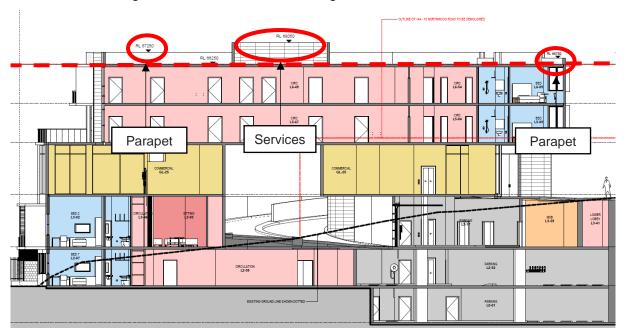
Extract from Section Plan, with maximum height limit highlighted with red dotted line (Source: Morrison Design Partnership)
